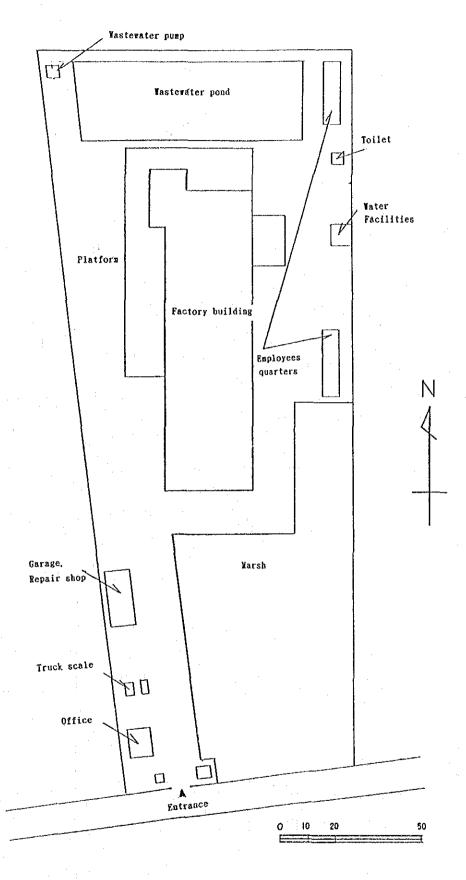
Site Plan of the Factory (Fish Meal Plant B)
